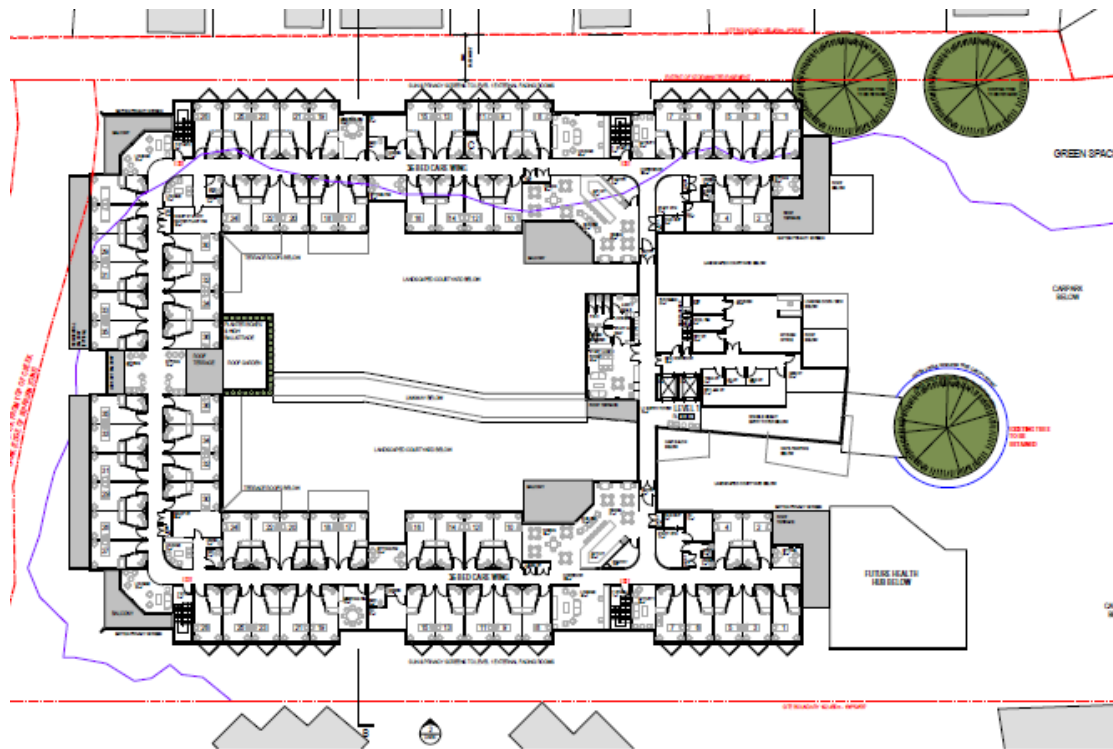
Ground Floor Plan (extract from submitted plans)
